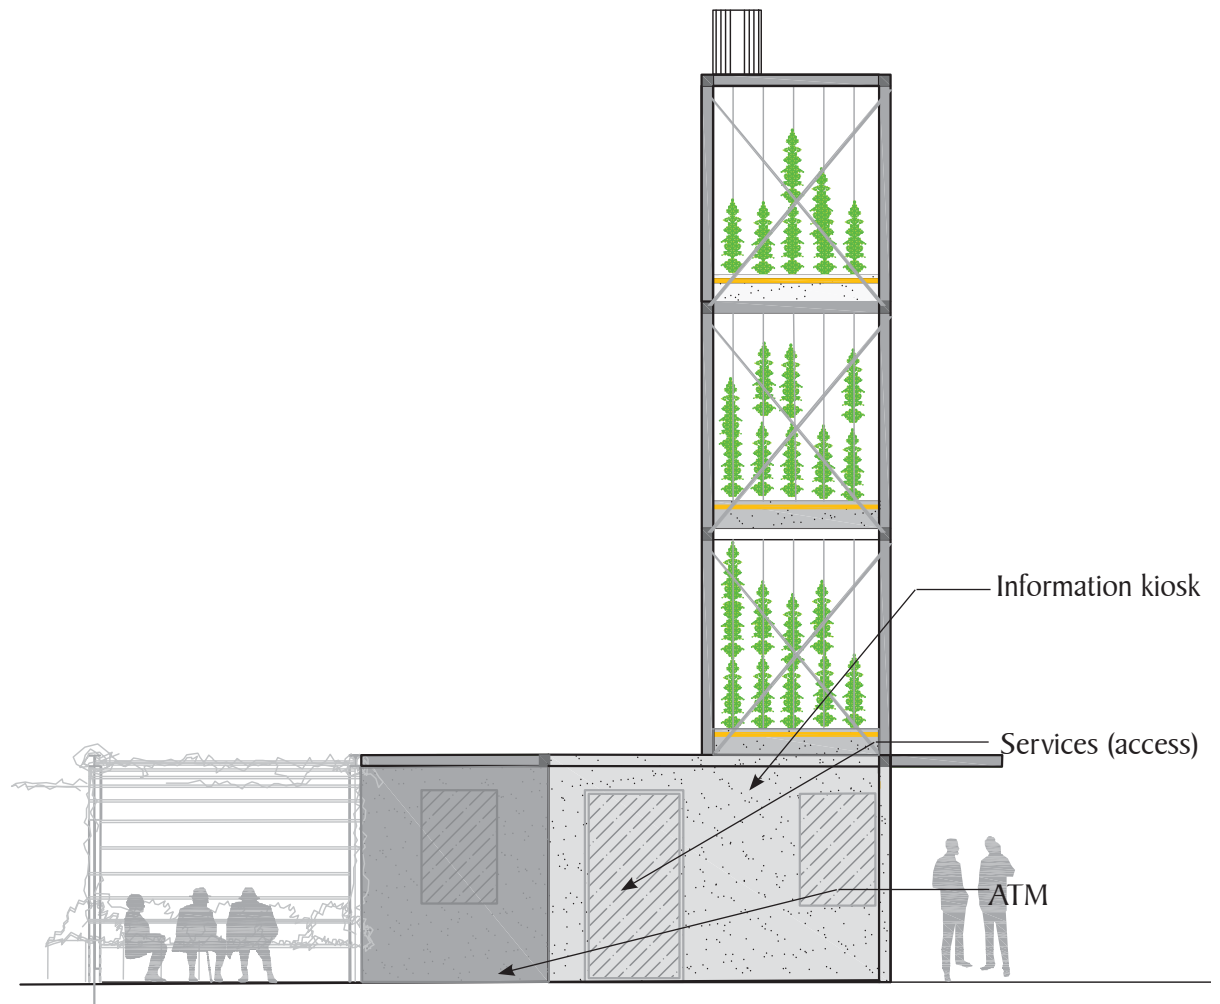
Green tower and information kiosk. Southern elevation. (Author, 2008) Scale 1 : 20
